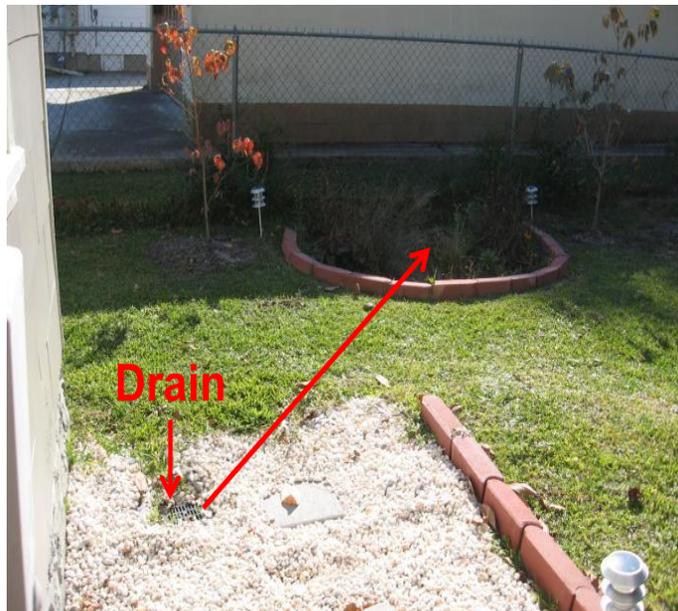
Using an existing yard inlet to deliver stormwater to a backyard rain garden.
